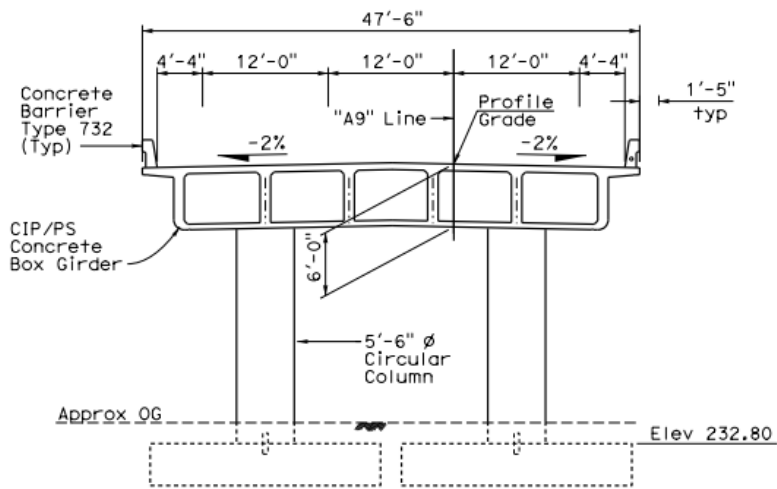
Cross-Section detail of OSB1 bridge deck (Caltrans)
